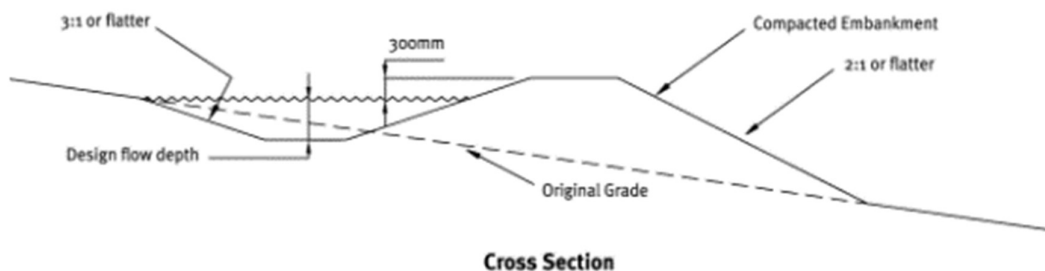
Alternative arrangement for diversion channels (AC GD05 Figure 19)
